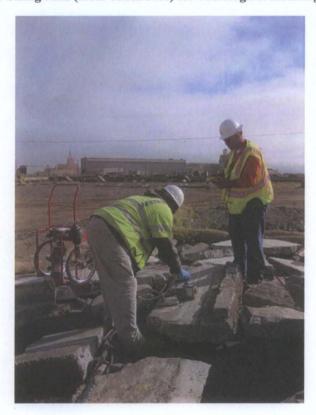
Excavating around former Building 380, facing northeast—June 1, 2012
